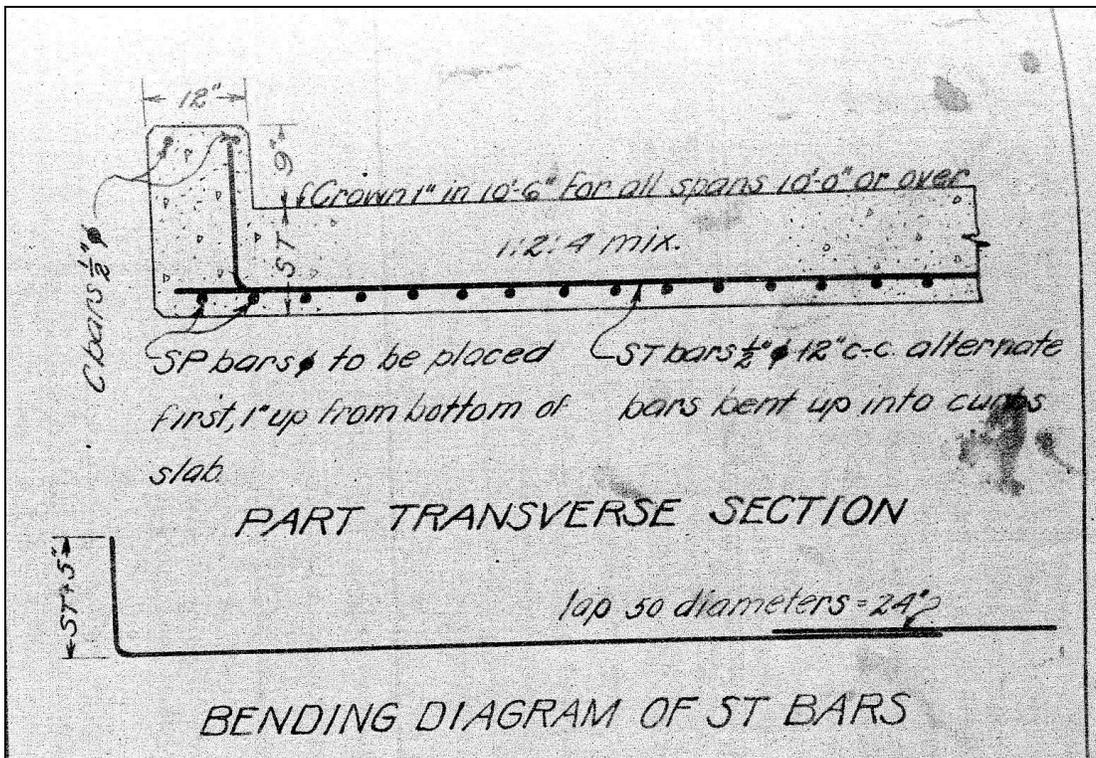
New Hampshire Highway Department standard design for reinforced concrete slab spans, October 31, 1924. When the standard was design was used and a separate set of plans were not prepared, the term "slab standard" was typically noted on bridge project and inventory cards in the place of a plan number (NHHD, 1924).
